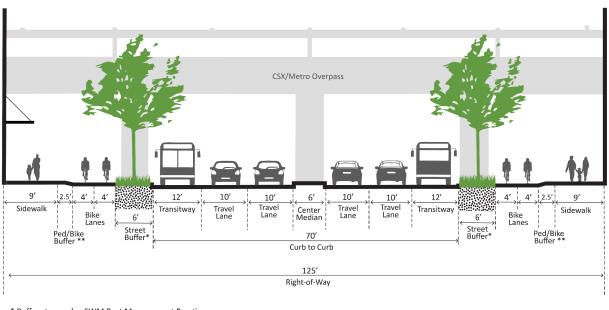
Colesville Road (M-20): Spring Street to Georgia Avenue, Looking North
